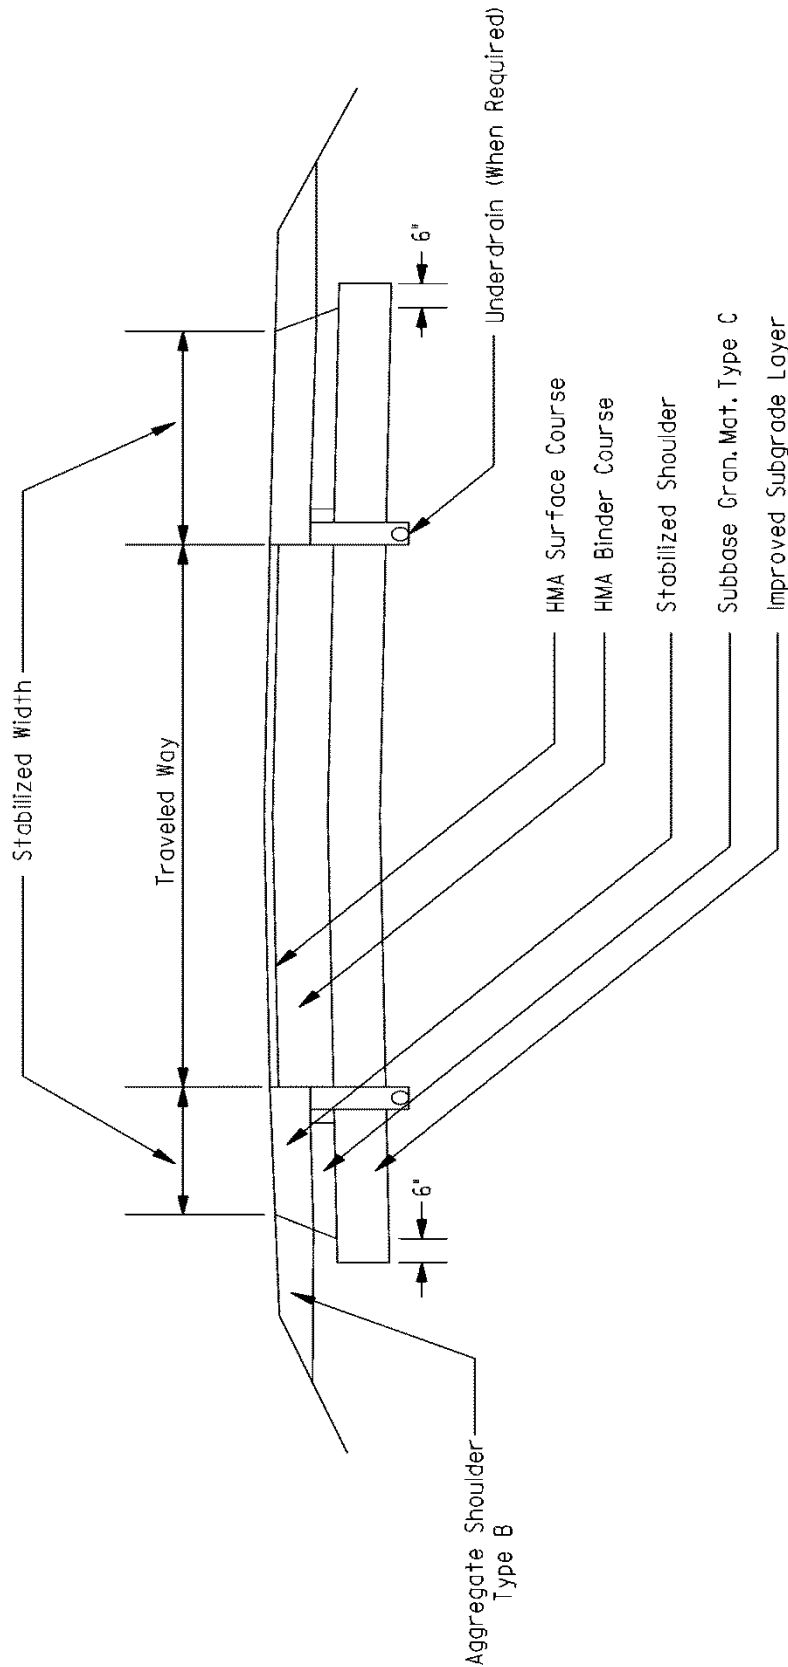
J through 54-5.L illustrate typical rural and urban pavement sections of flexible designs for various types of highway facilities.
